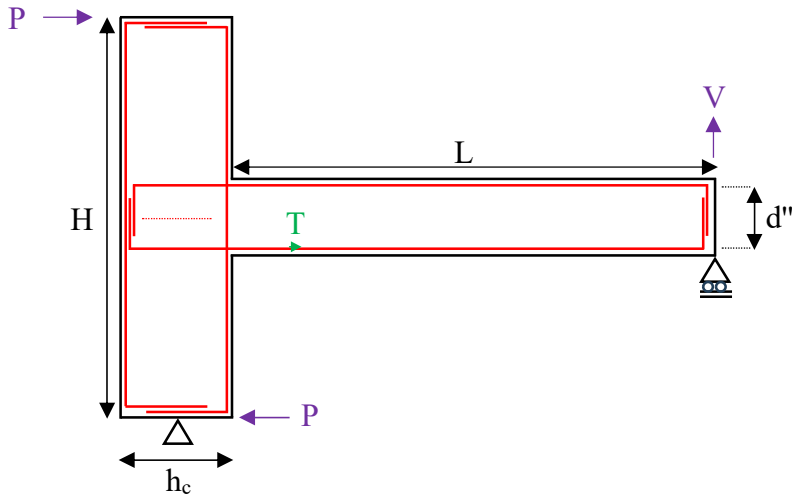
Exterior beam-to-column connection loaded at the column top.
